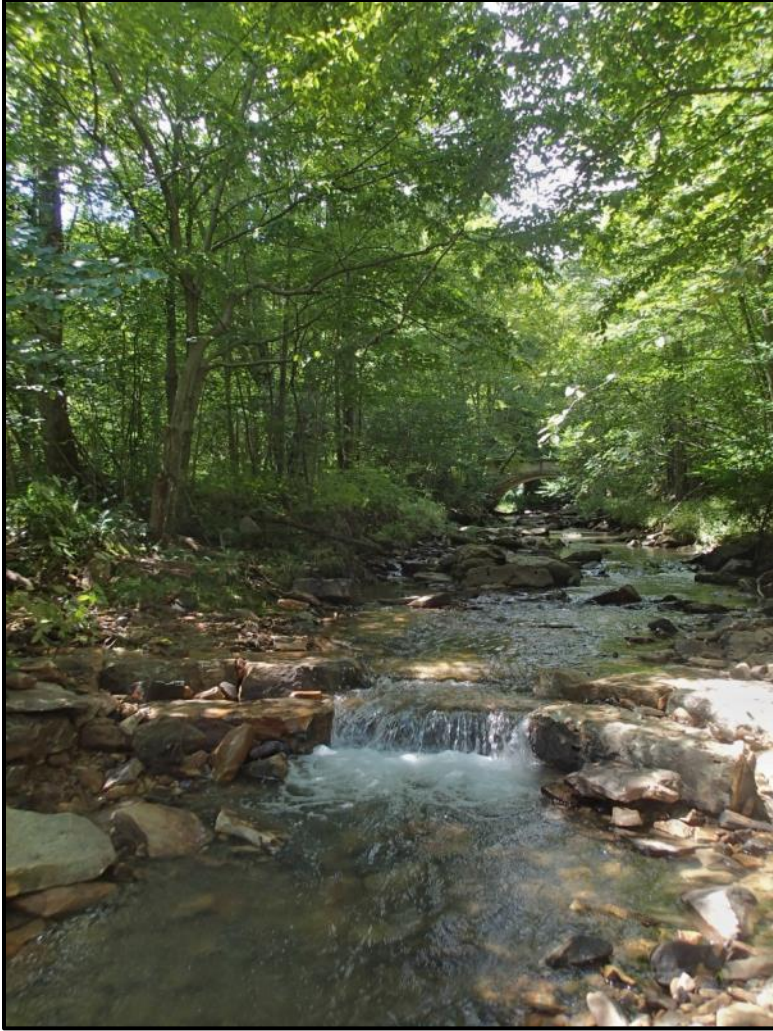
Rock cross vane constructed from cut sandstone salvaged from bridge pier.
